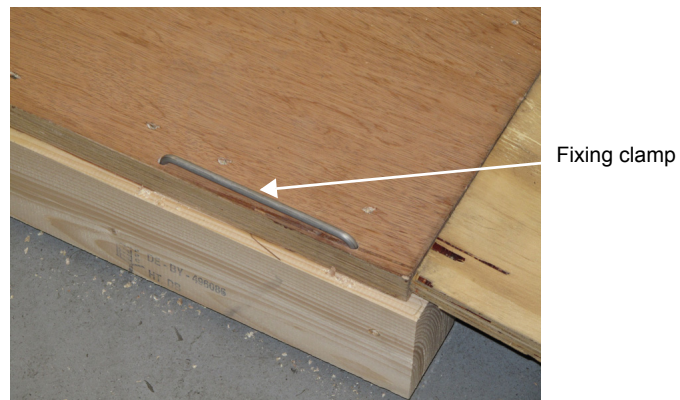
Fixing clamp hooked up in the drill holes on the pallet
